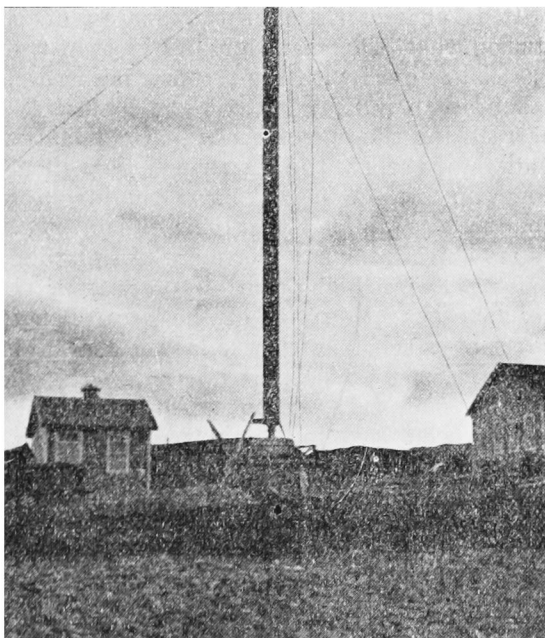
FOUNDATION OF TOWER, SHOWING PIVOT ON WHICH THE STRUCTURE RESTS.
